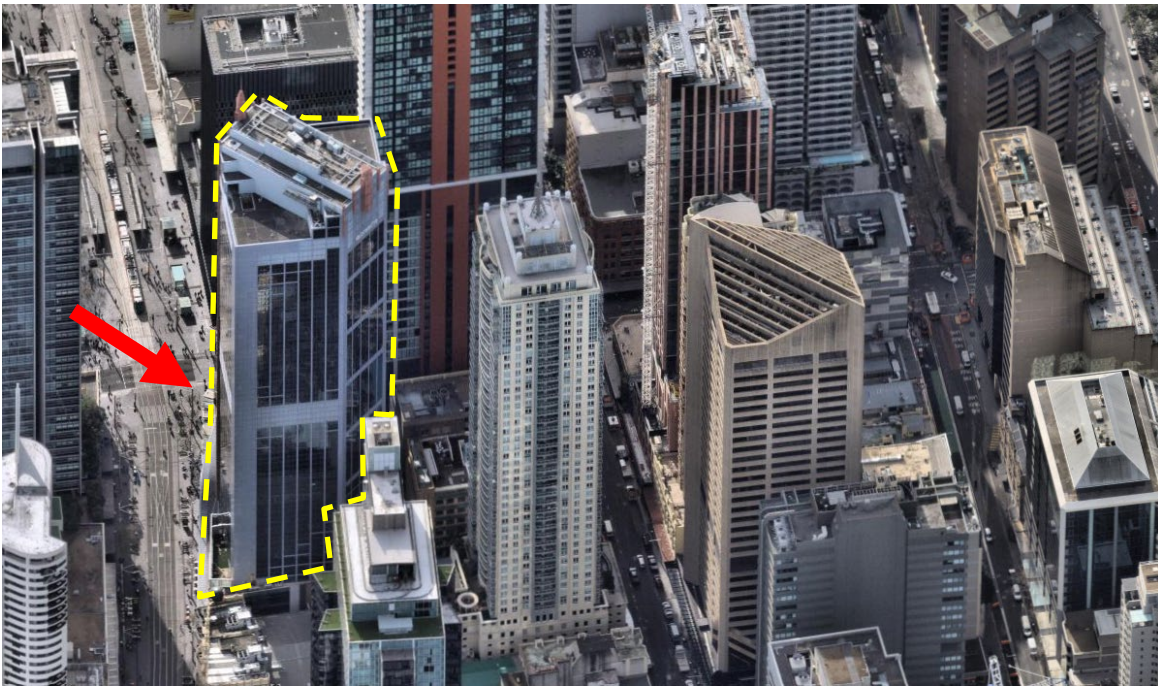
View of the Sydney CBD looking north toward the subject site – marked by red arrow (yellow dash highlights the subject tower).
